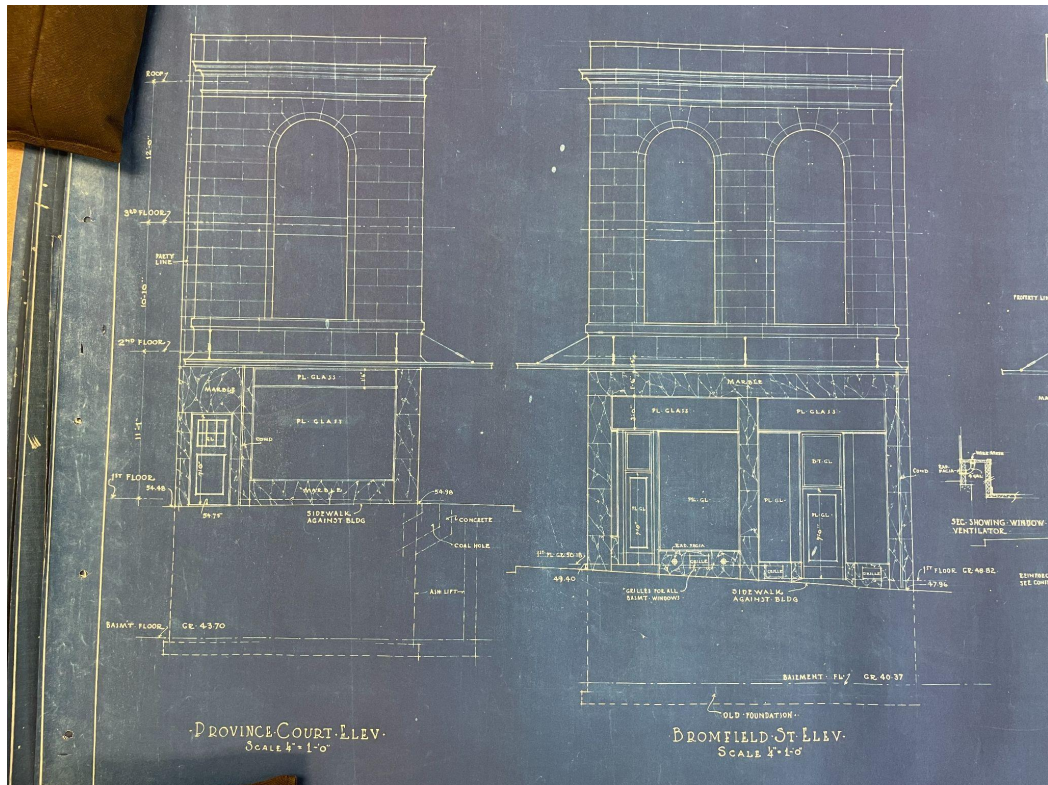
Original building plans showing the Bromfield St. elevation and Province Ct. elevation.
